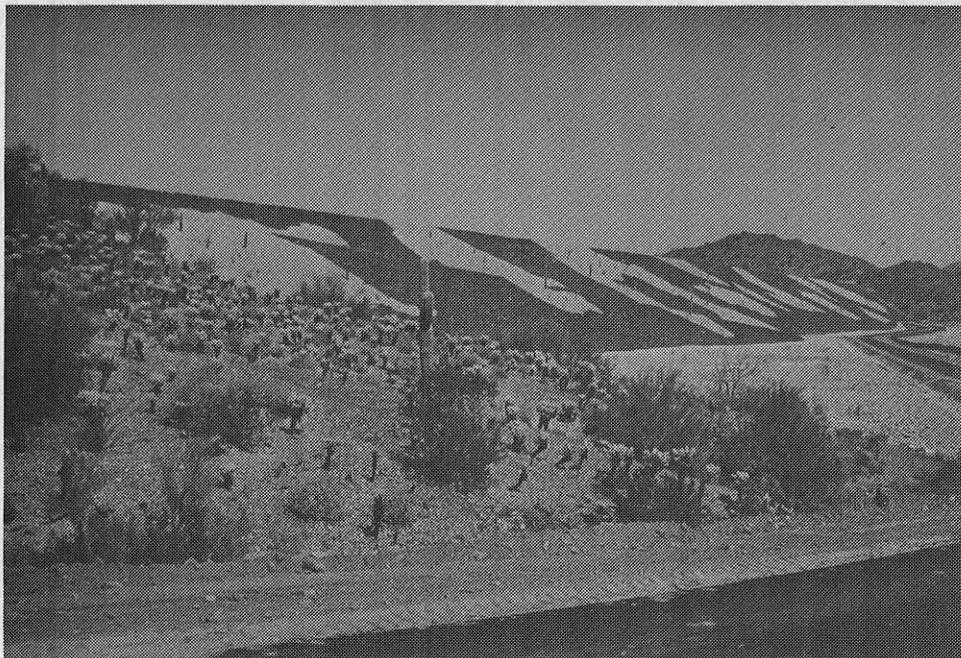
Landscaped downstream face of dam embankment as viewed from spillway access road. March 1985
